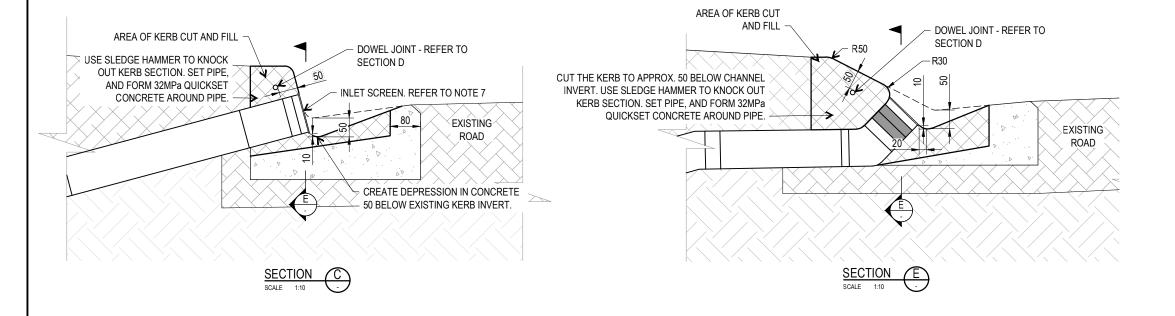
TYPE 'E' (BARRIER) KERB INLET
